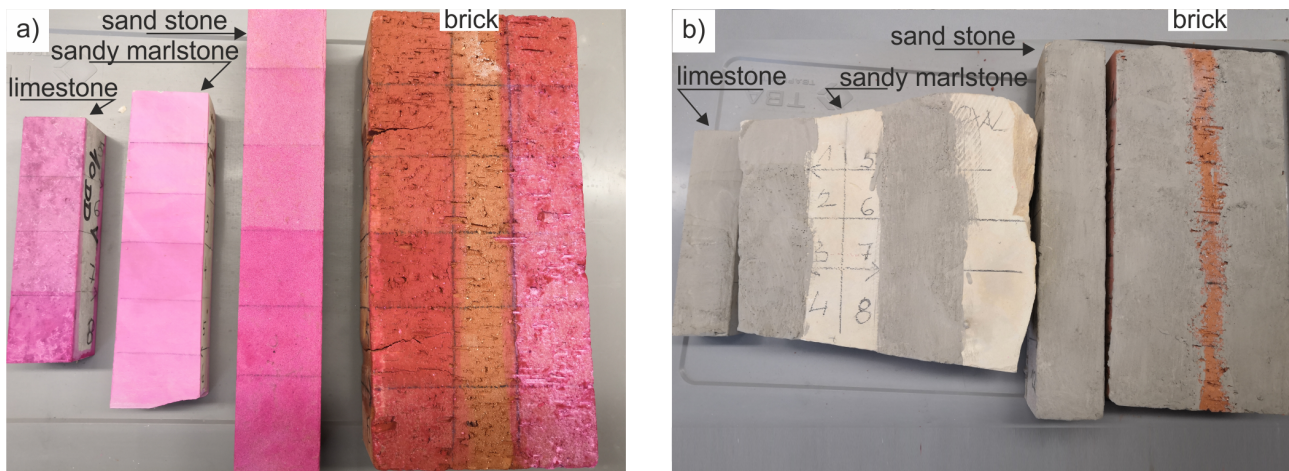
Example of test pieces with a bonding primer a) using V5, b) using V3
